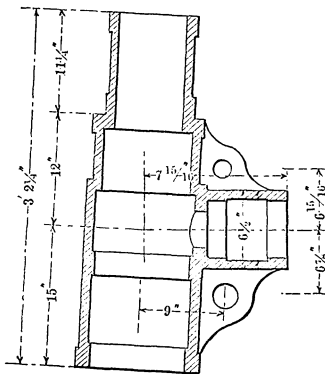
Section of Column Joint in Plane through Center of Tower.
